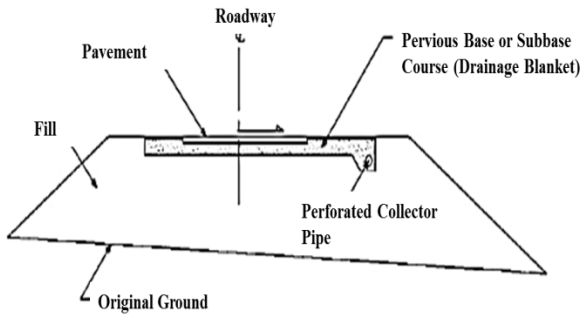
(a): Longitudinal collector drain used to seeping into pavement structural section.
